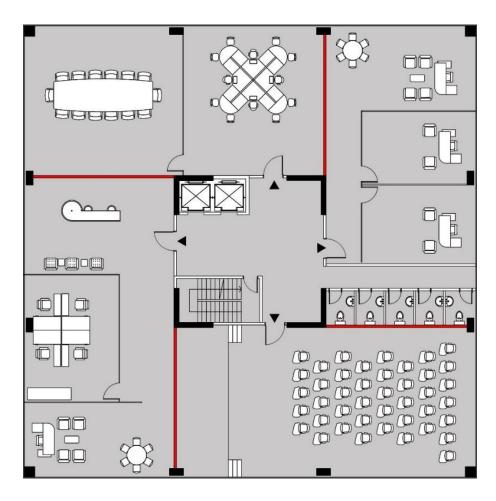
Typical floor plan of sample office buildings and each drywall under analyses in red color
